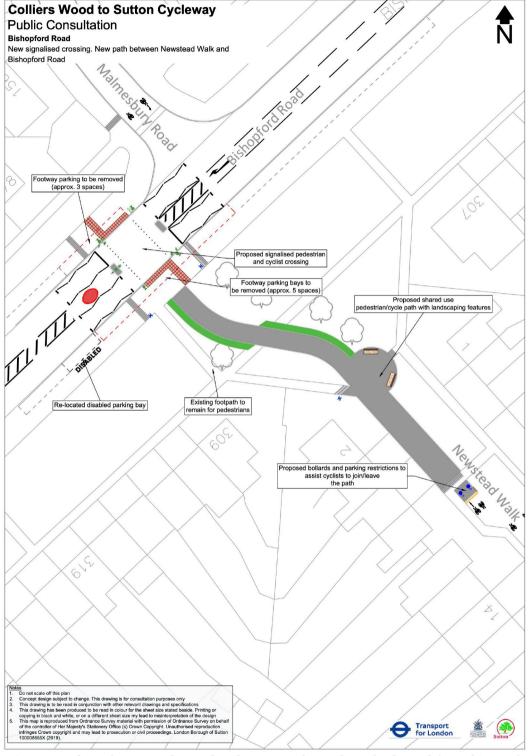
Plan of proposed signalised crossing for Bishopsford Road (LB of Sutton)
